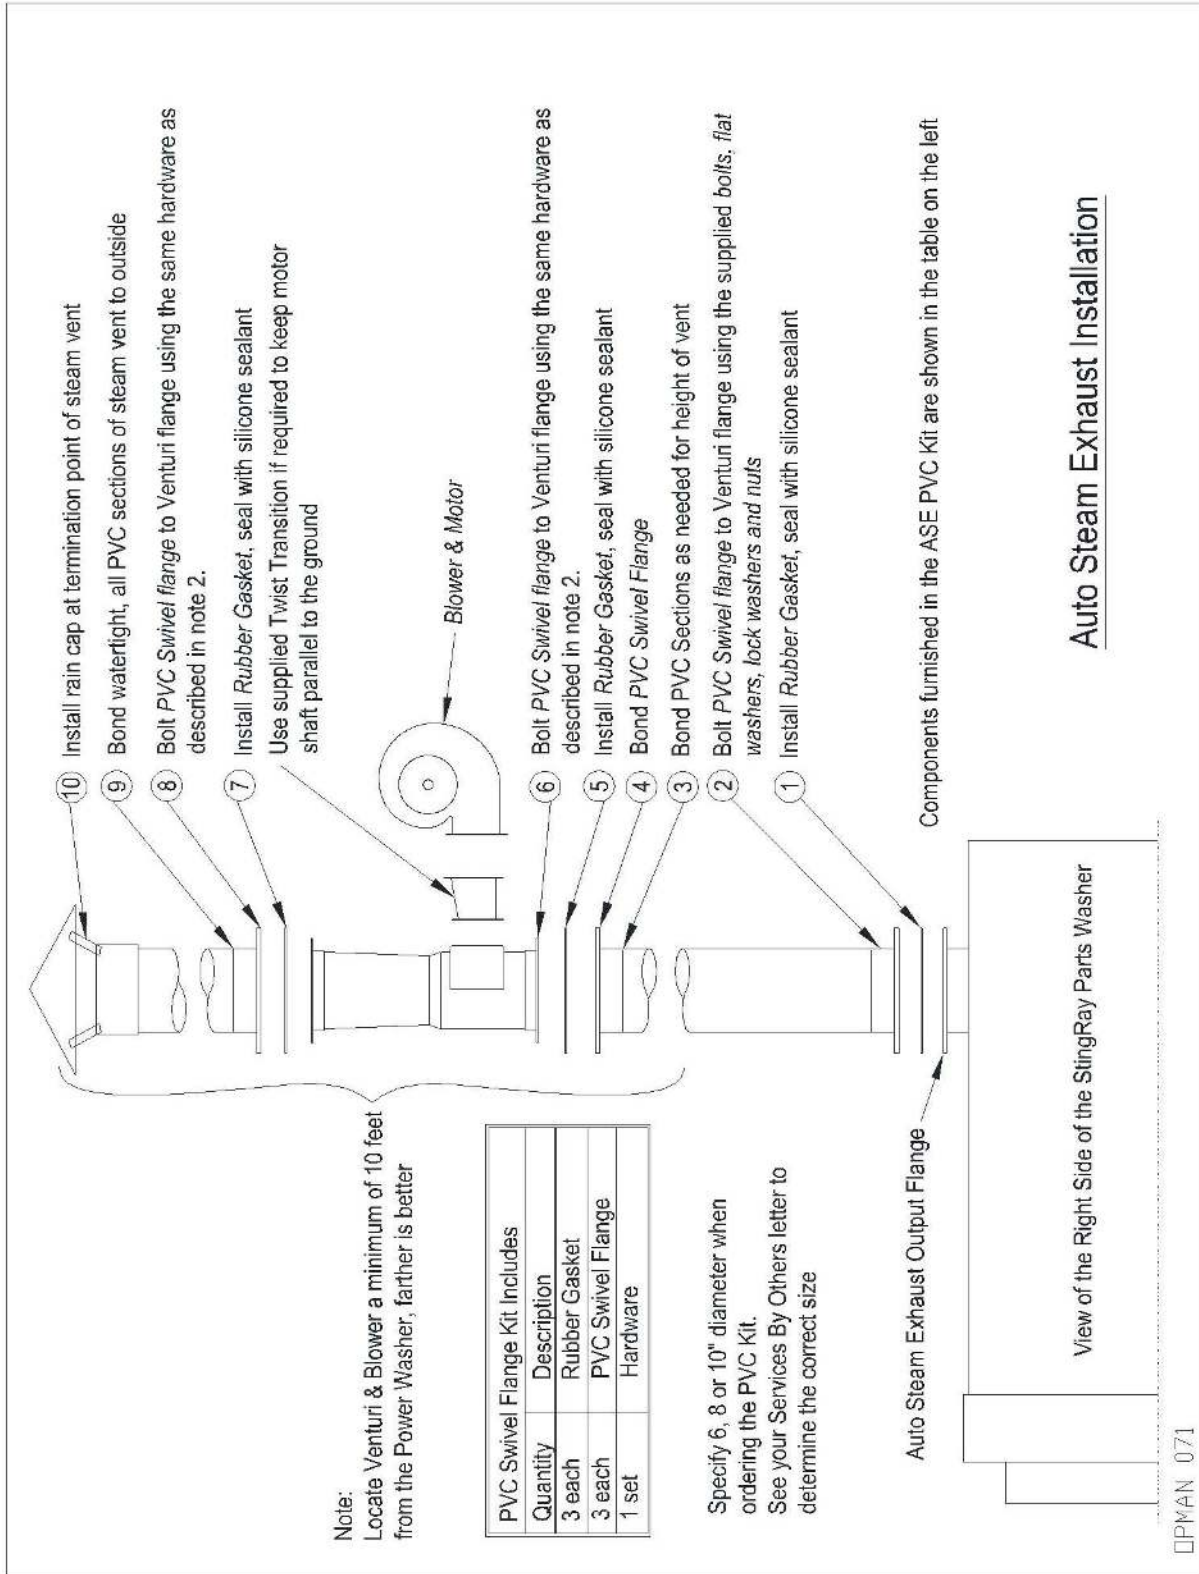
14: Auto Steam Exhaust (ASE) Piping and Blower Assembly
